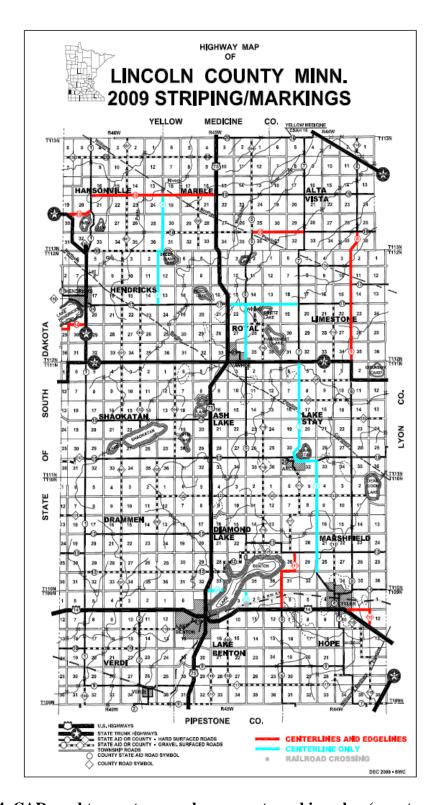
CAD used to create annual pavement marking plan (county-wide map)
